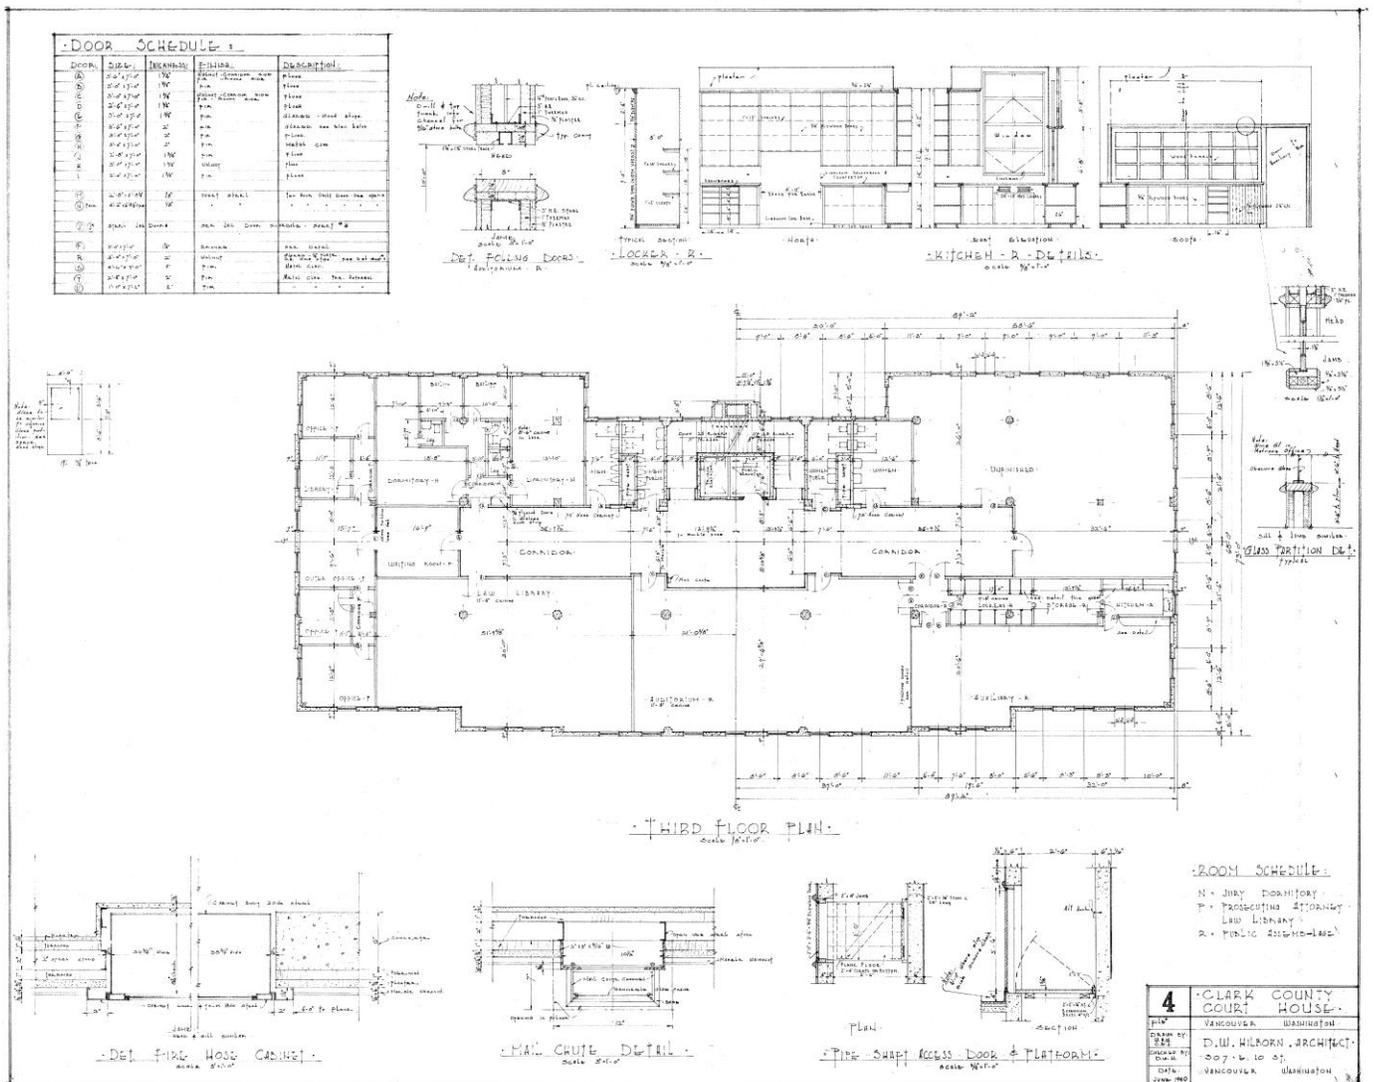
Courthouse Floor Plan Drawing – Third Floor
